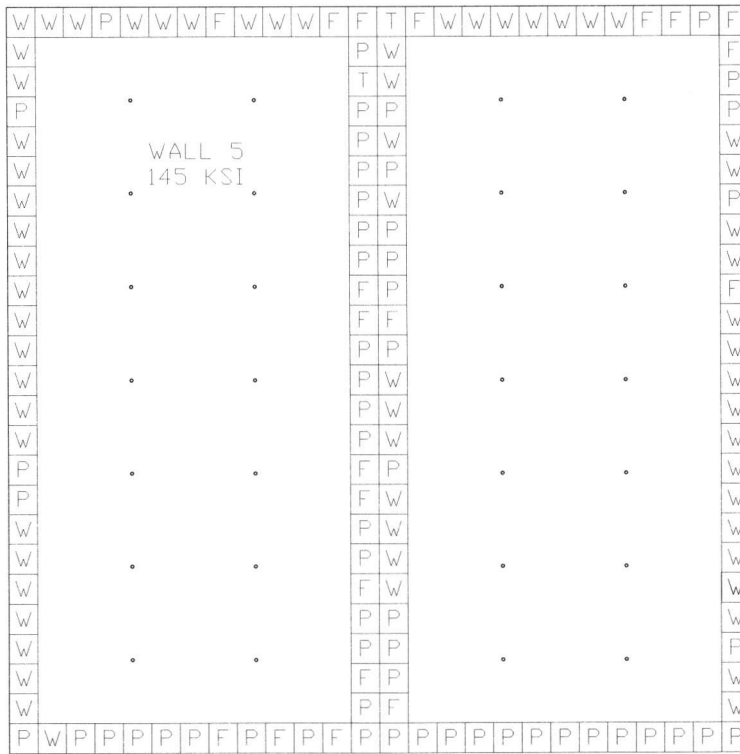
Sheathing nail failure modes for Wall 5, $f_{yb}=145$ ksi.
